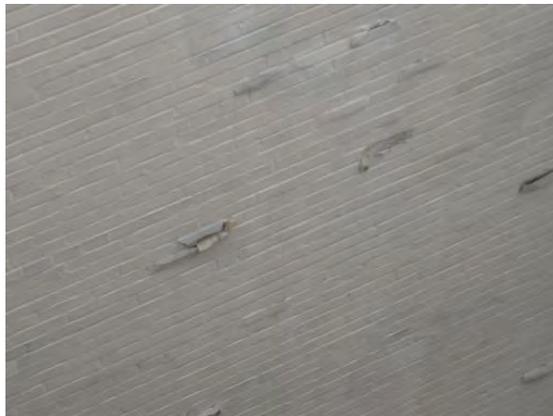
(3): Post-Coating Spalling, East
